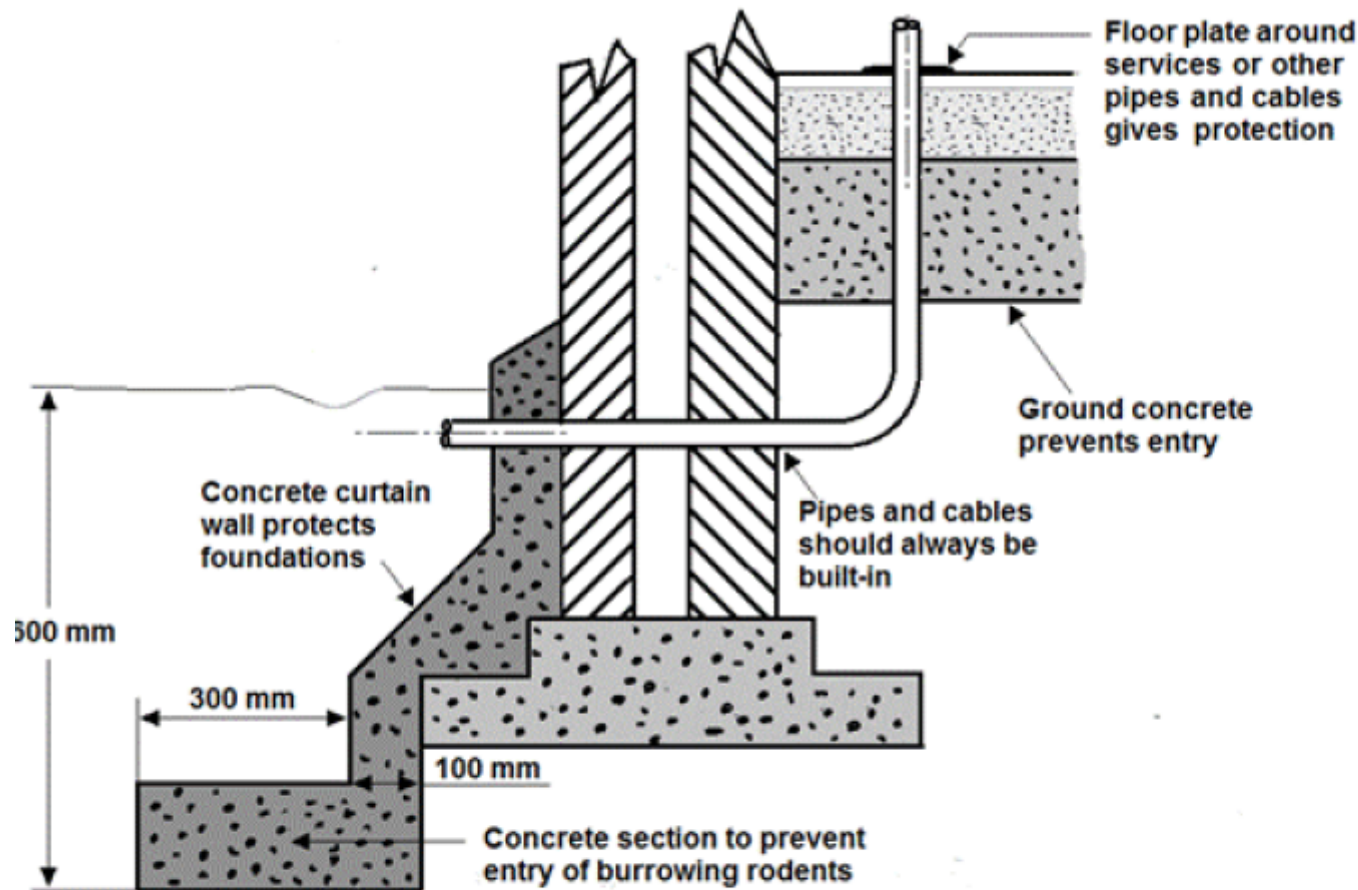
Pest proofing measure to prevent entry through foundations
